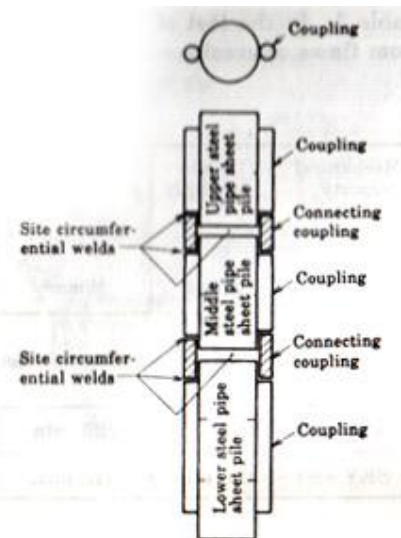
Constitution of steel pipe sheet piles connected on site and designation of each part
